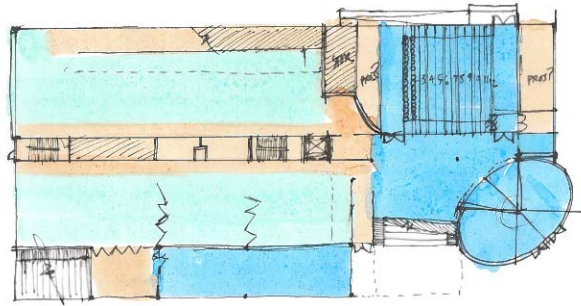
First Floor Plan of “Bridge Flow” scheme, image by author.
